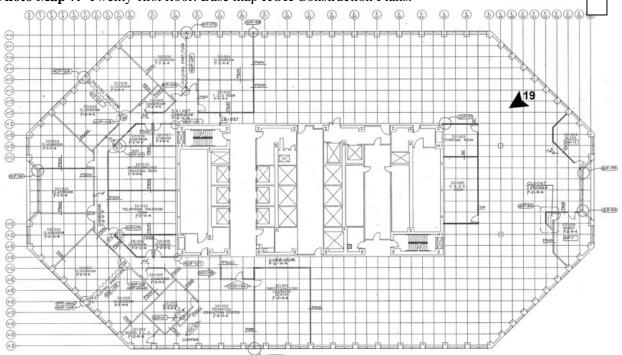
Twenty-first floor. Base map HOK Construction Plans.
